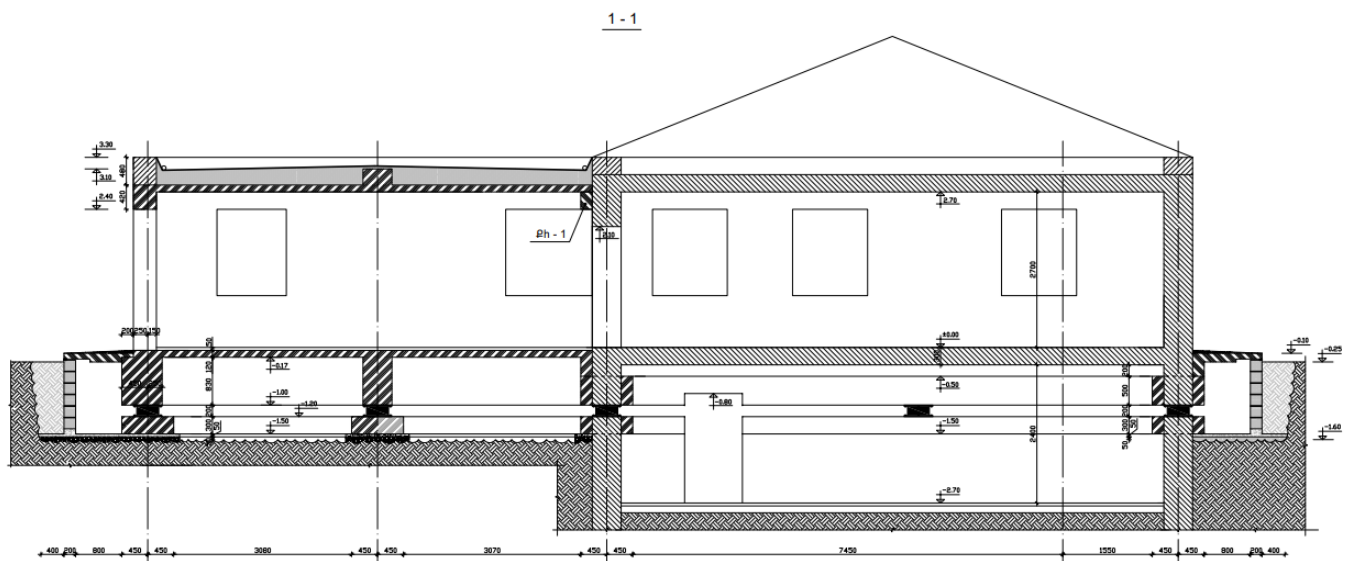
Vertical elevation 1-1 in longitudinal direction of the base isolated existing stone kindergarten building together with its extension to be newly constructed.
